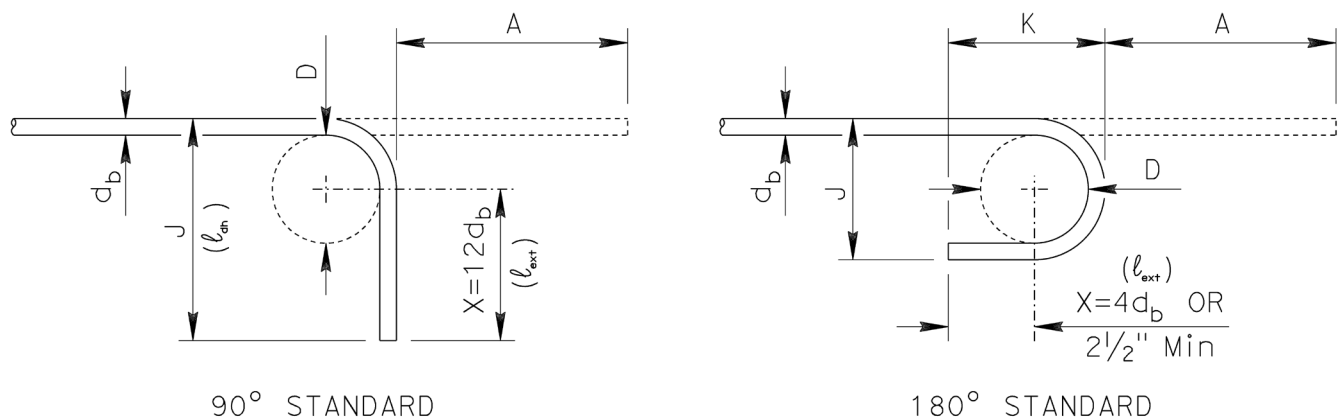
Hook and Bend Details for Primary Reinforcement
